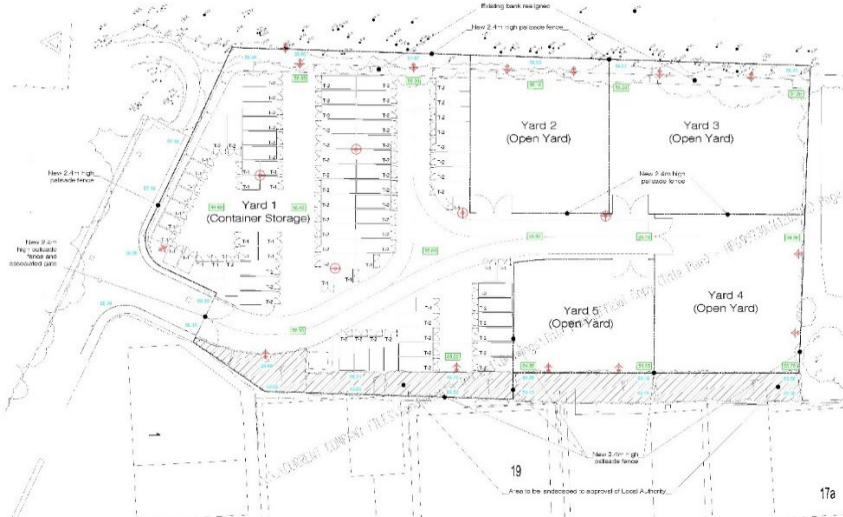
Extract from proposed site layout showing the open yards to the rear of the site, along with the land on which it is proposed to site the steel shipping containers for self-storage.
